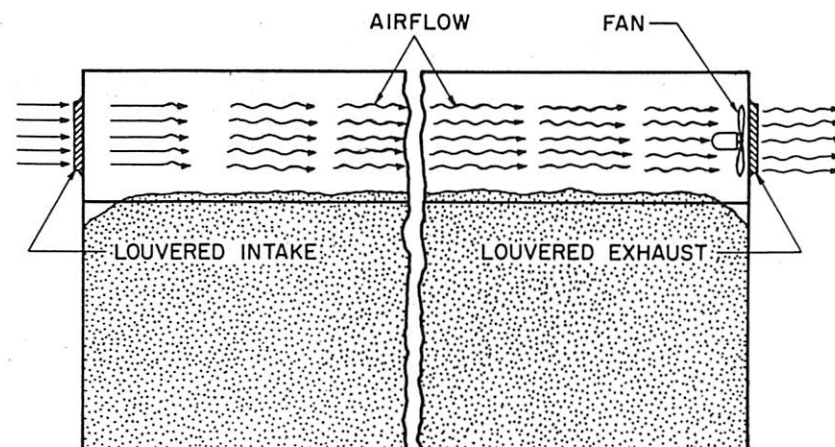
Schematic showing a typical mechanical ventilation system installed in a farmers stock peanut warehouse.
